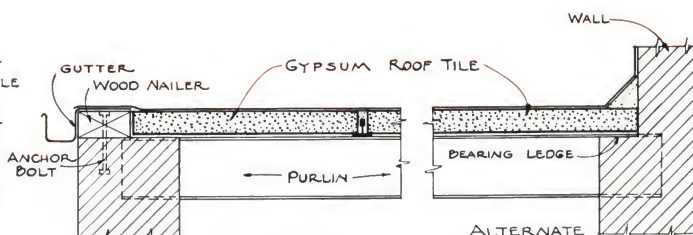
DETAILS OF PYROBAR SHORT SPAN ROOF TILE
